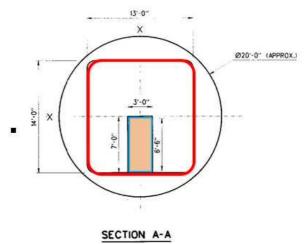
CANDU-6 Equipment Airlock Door Sizes
